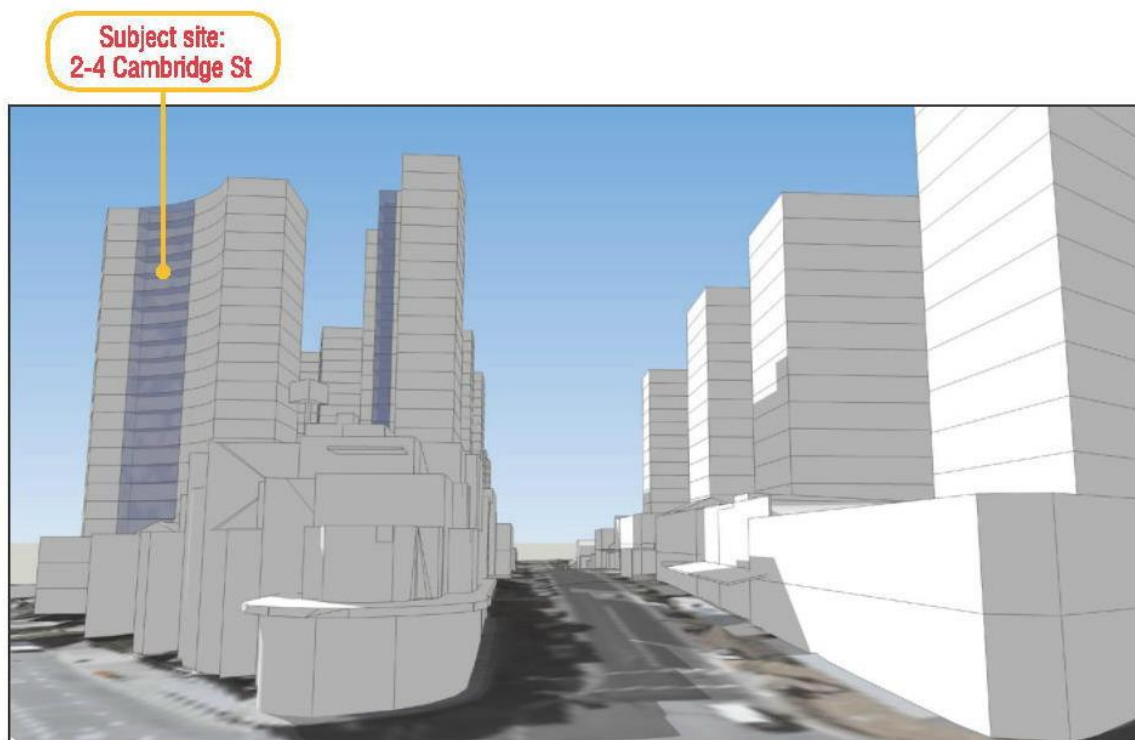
View of potential built form at corner of Pembroke, Oxford and Cambridge Street.
